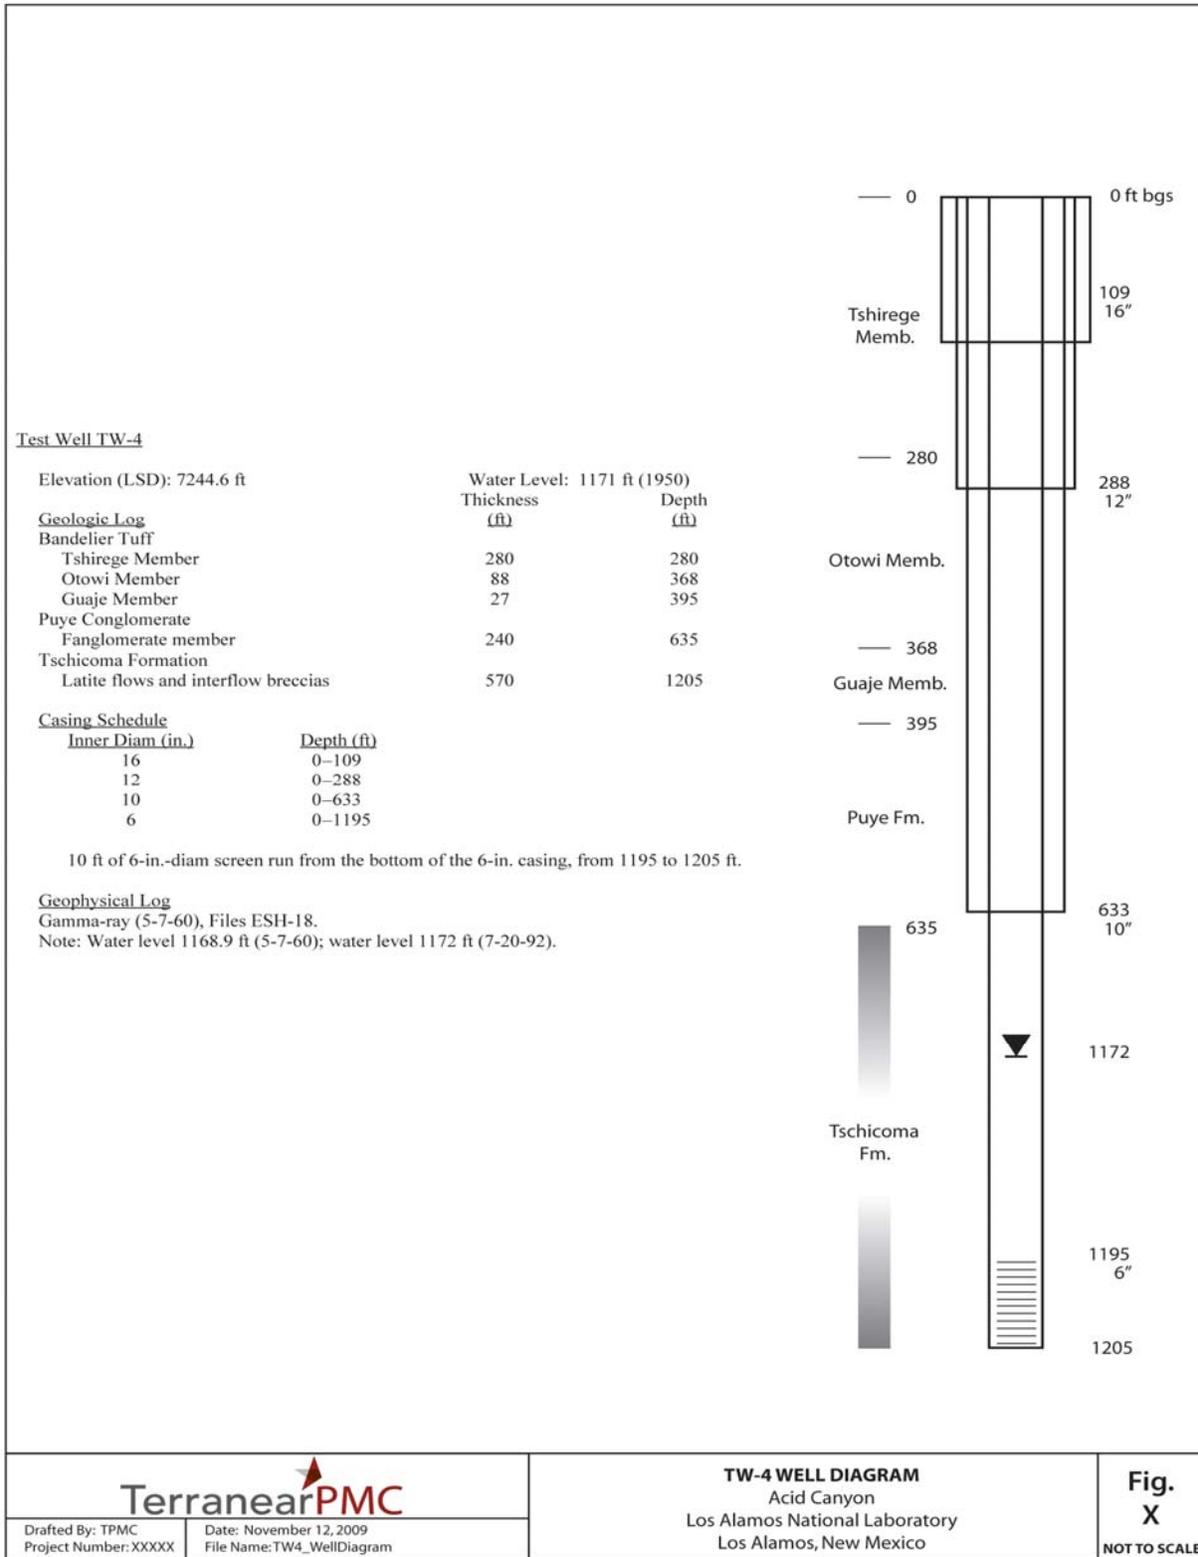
Monitoring well TW-4 as-built well construction diagram
